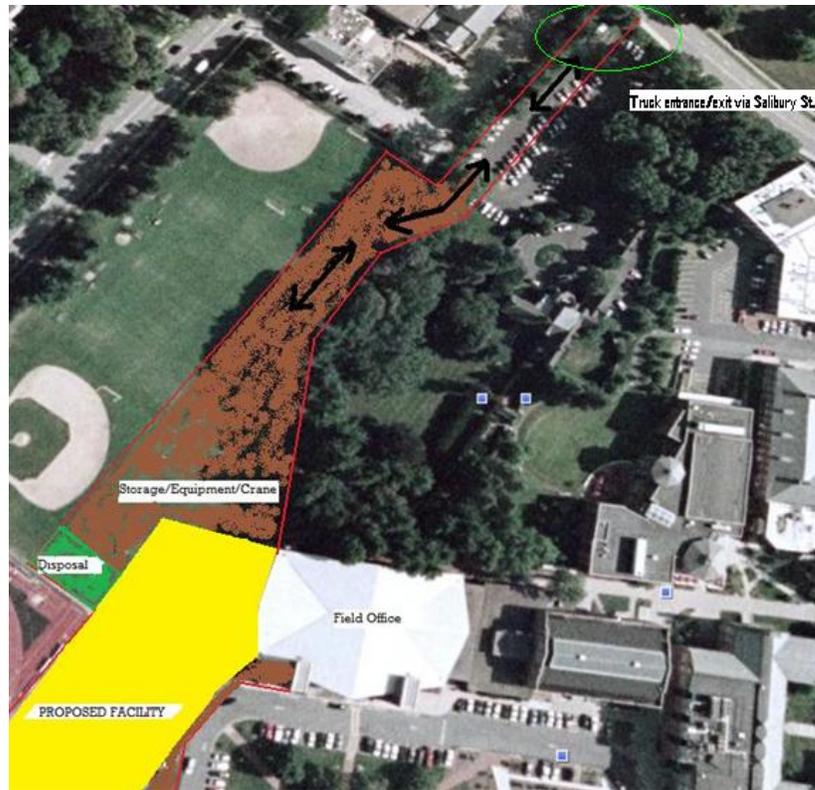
Site plan 2 utilizing the WIP Higgins House parking lot
